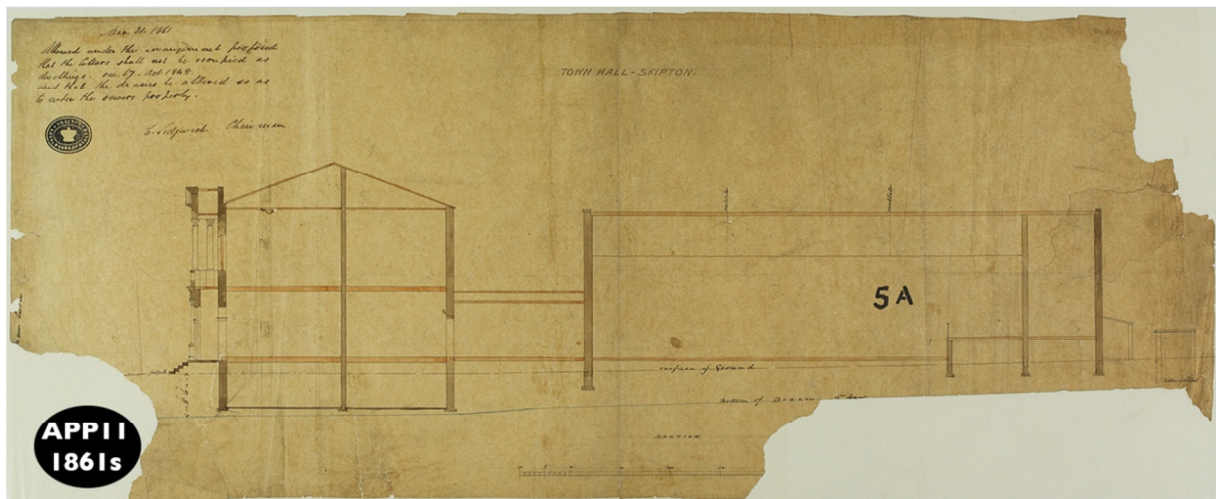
1861 section through the building, see 3.4.3 above. Note the single storey 'waiting hall' link with south entrance shown on the plan above.
